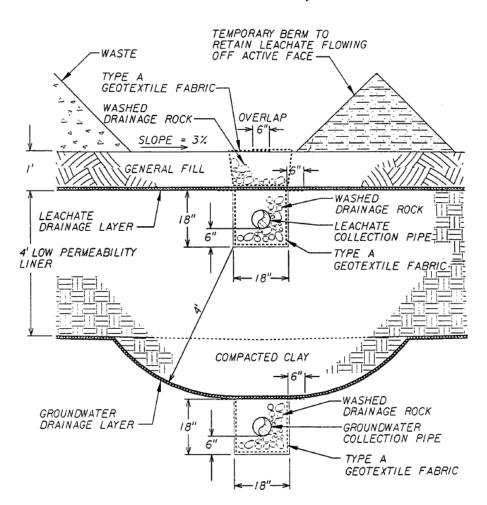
Cross-Section of Ottumwa Midland Landfill Leachate and Underdrain Collection System. ¹⁶
